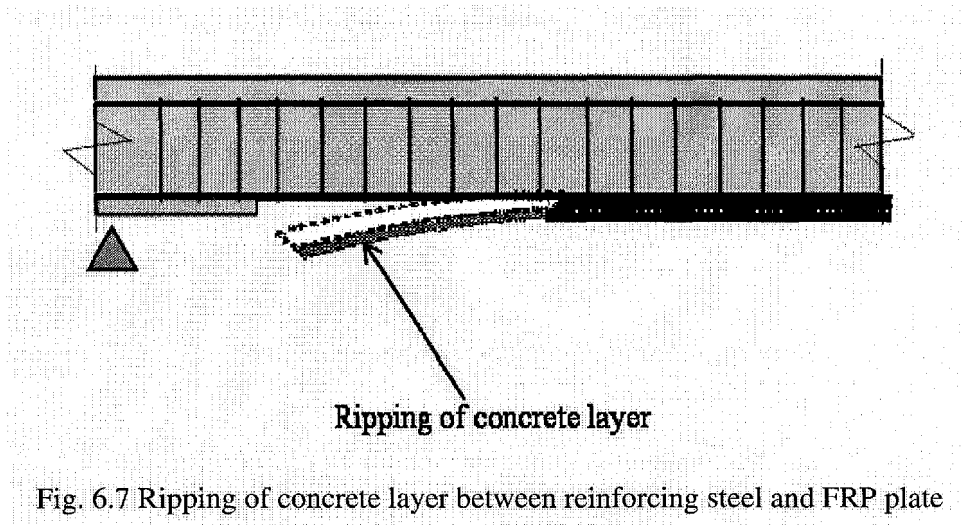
Ripping of concrete layer between reinforcing steel and FRP plate
